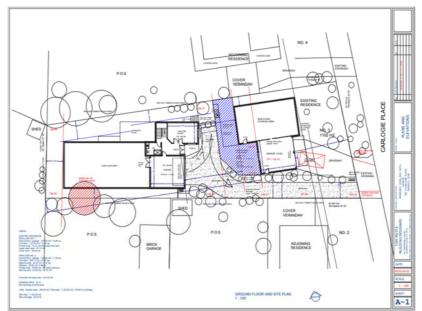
Ground Floor and Site plan, showing the proposed dwelling to the left of page
